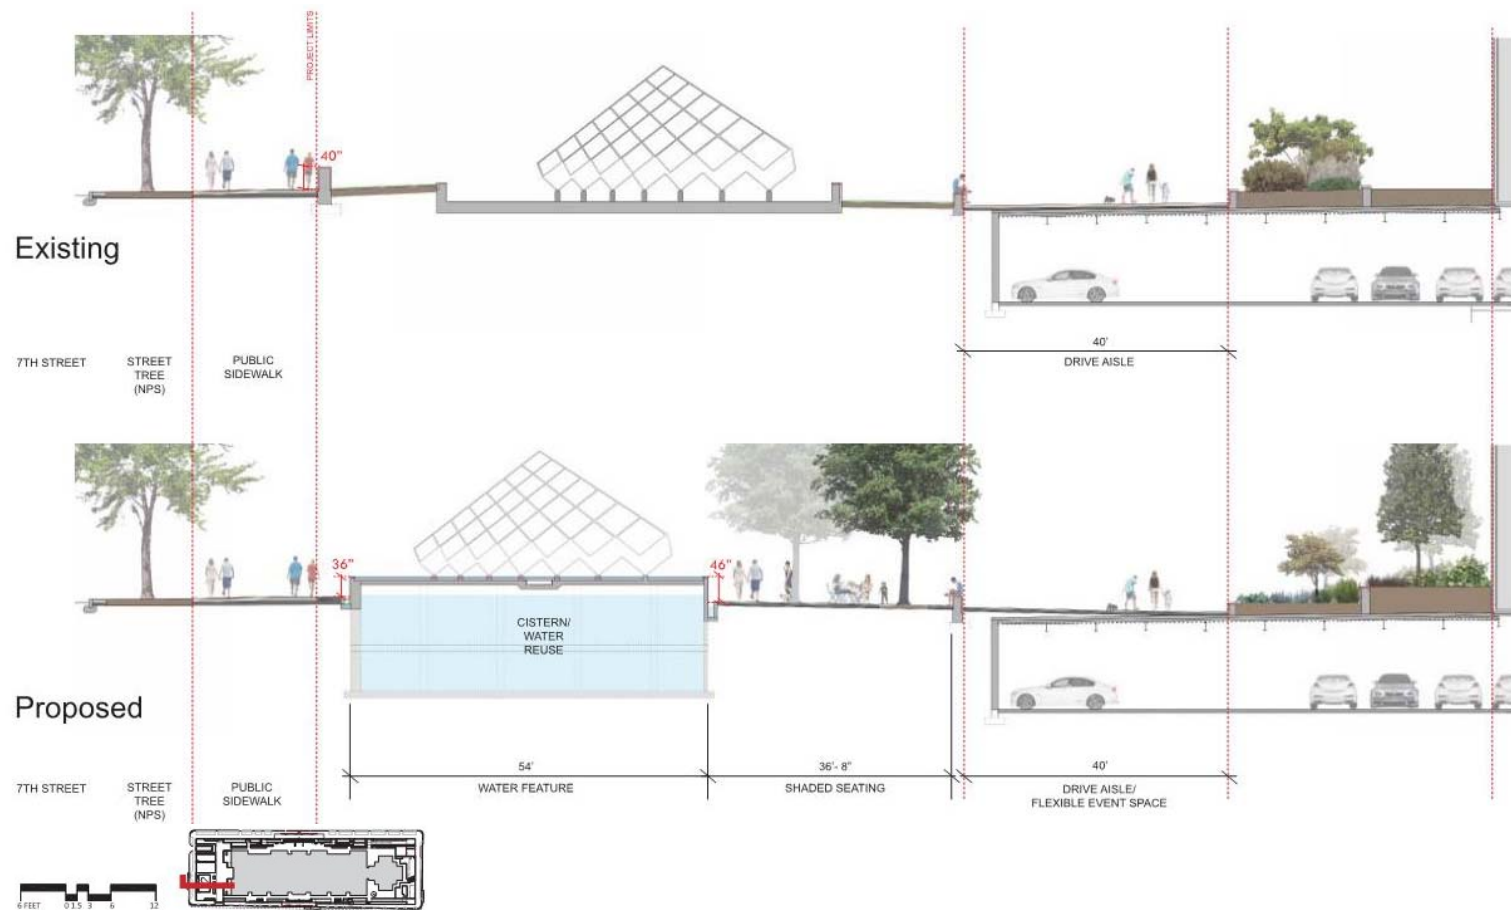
29: Southwest Section, Existing and Proposed Condition (with Alternate Fountain). (Source: AECOM.)
